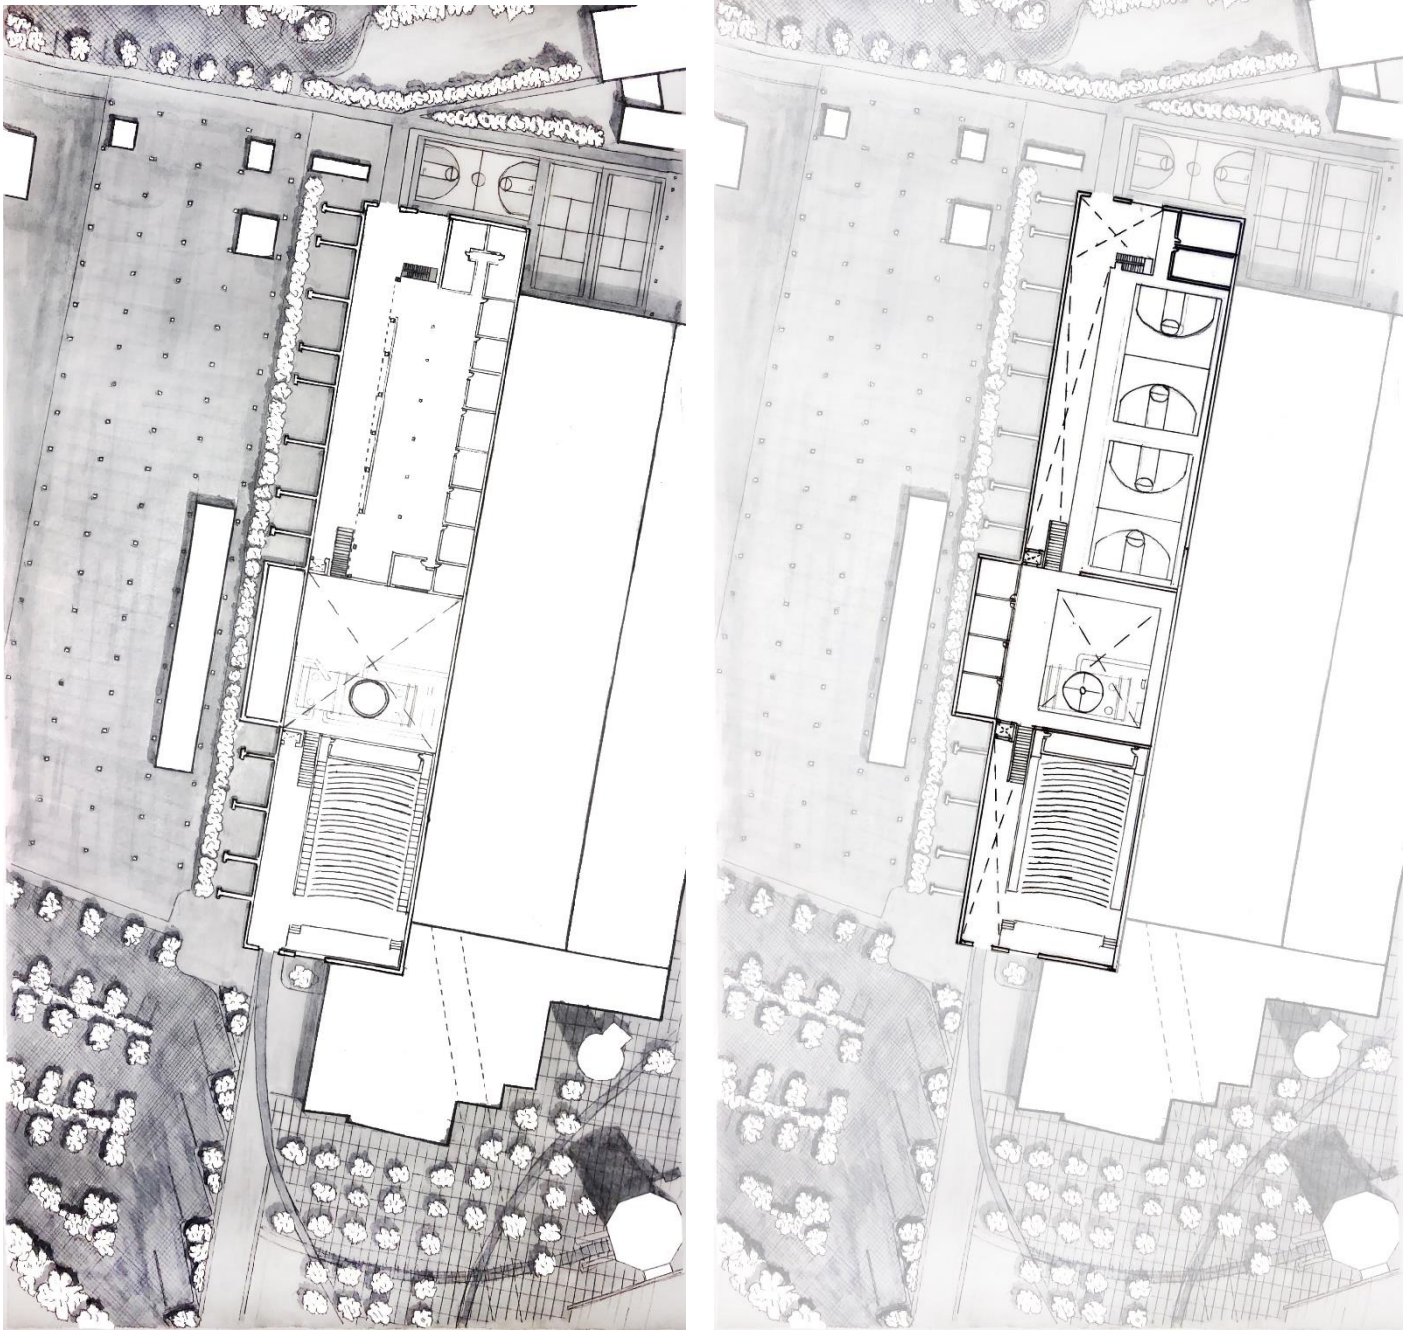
Turbine Room 1st & 2nd Floor Plans (source: Author)
